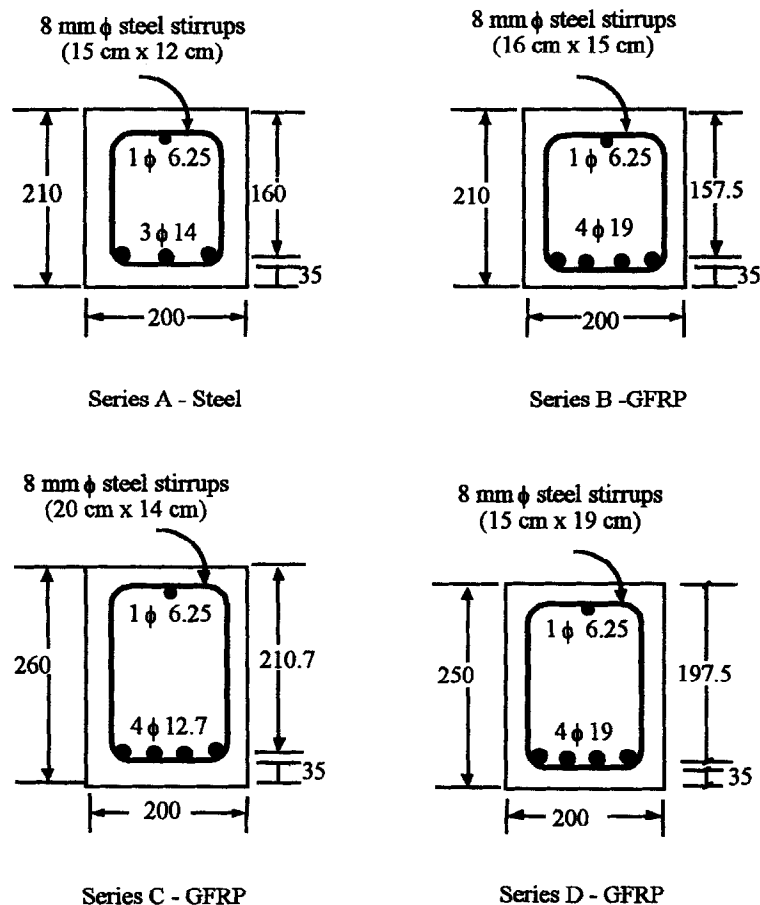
Cross-section and reinforcement details for beams in series A, B, C, and D.
